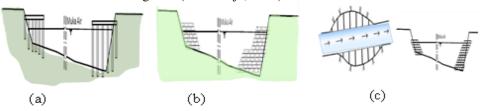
Permeable crib construction (a), semi-permeable crib construction (b), and impermeable crib location and construction (c).
